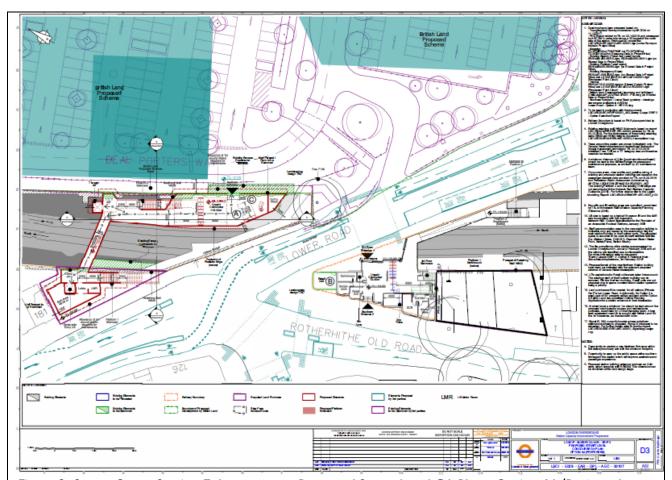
Surrey Quays Station Enhancement - Proposed Street Level GA Plan - Option 6A (Preferred Option)
